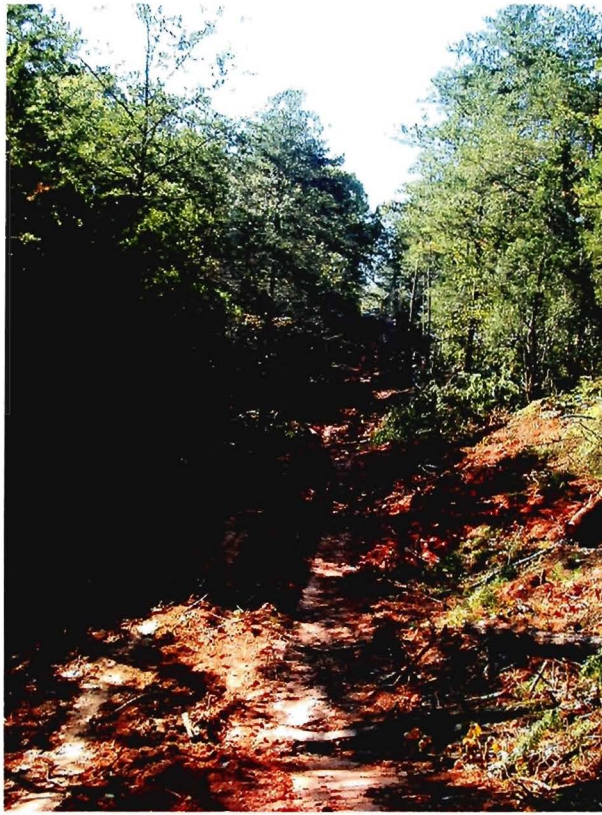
Proposed road corridor showing erosion, sloping topography, and exposed red clay.
